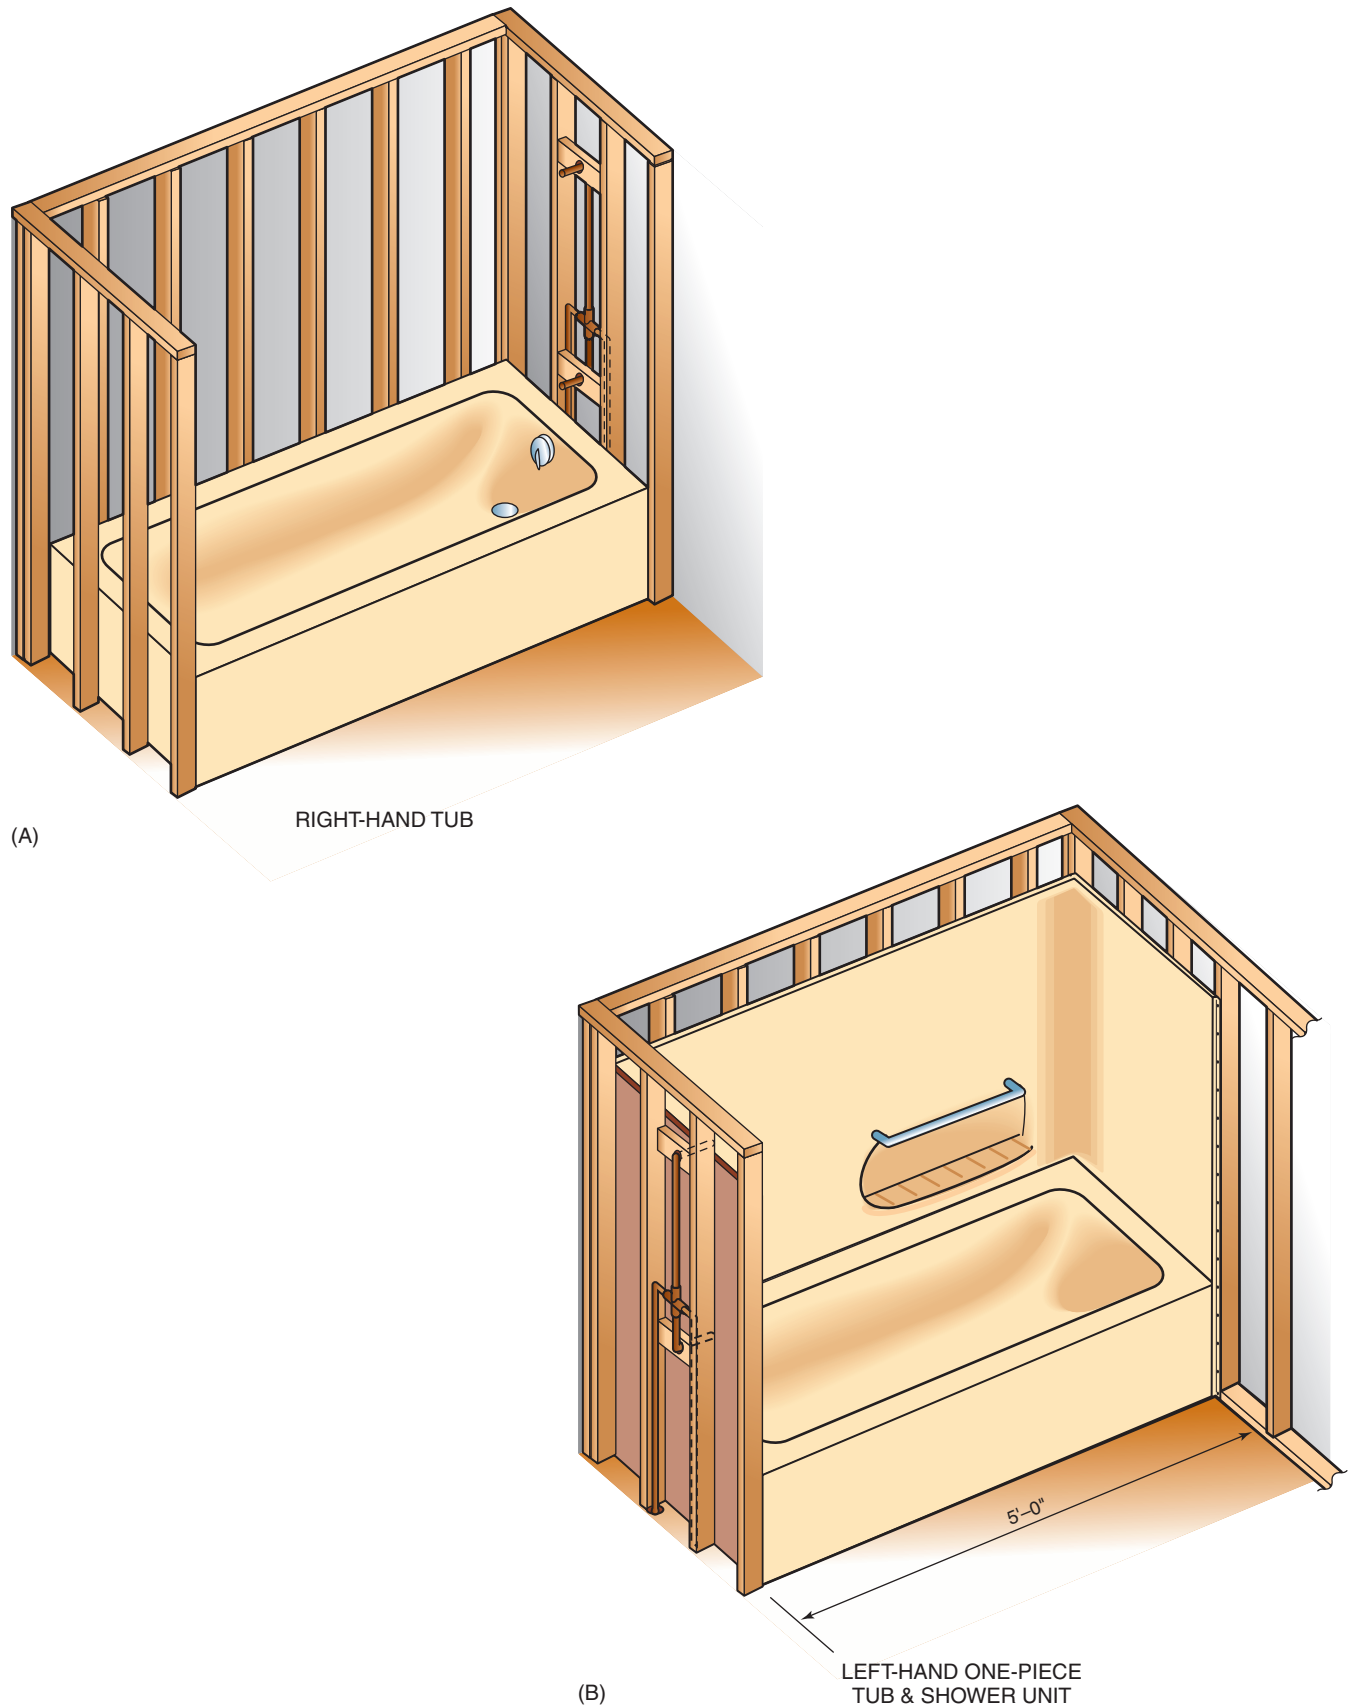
A left-hand or right-hand tub is ordered based on which side the user exits the fixture.
